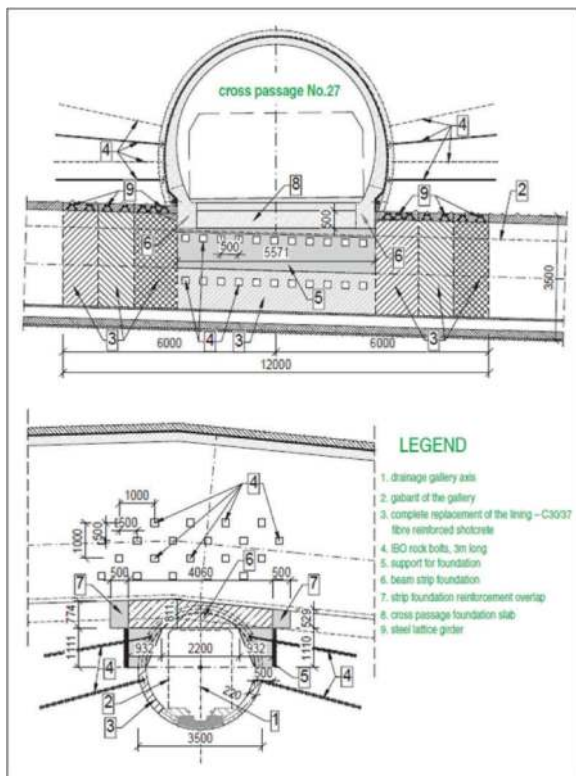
Intersection with cross passage No. 27 – cross-section and longitudinal section through the gallery.
